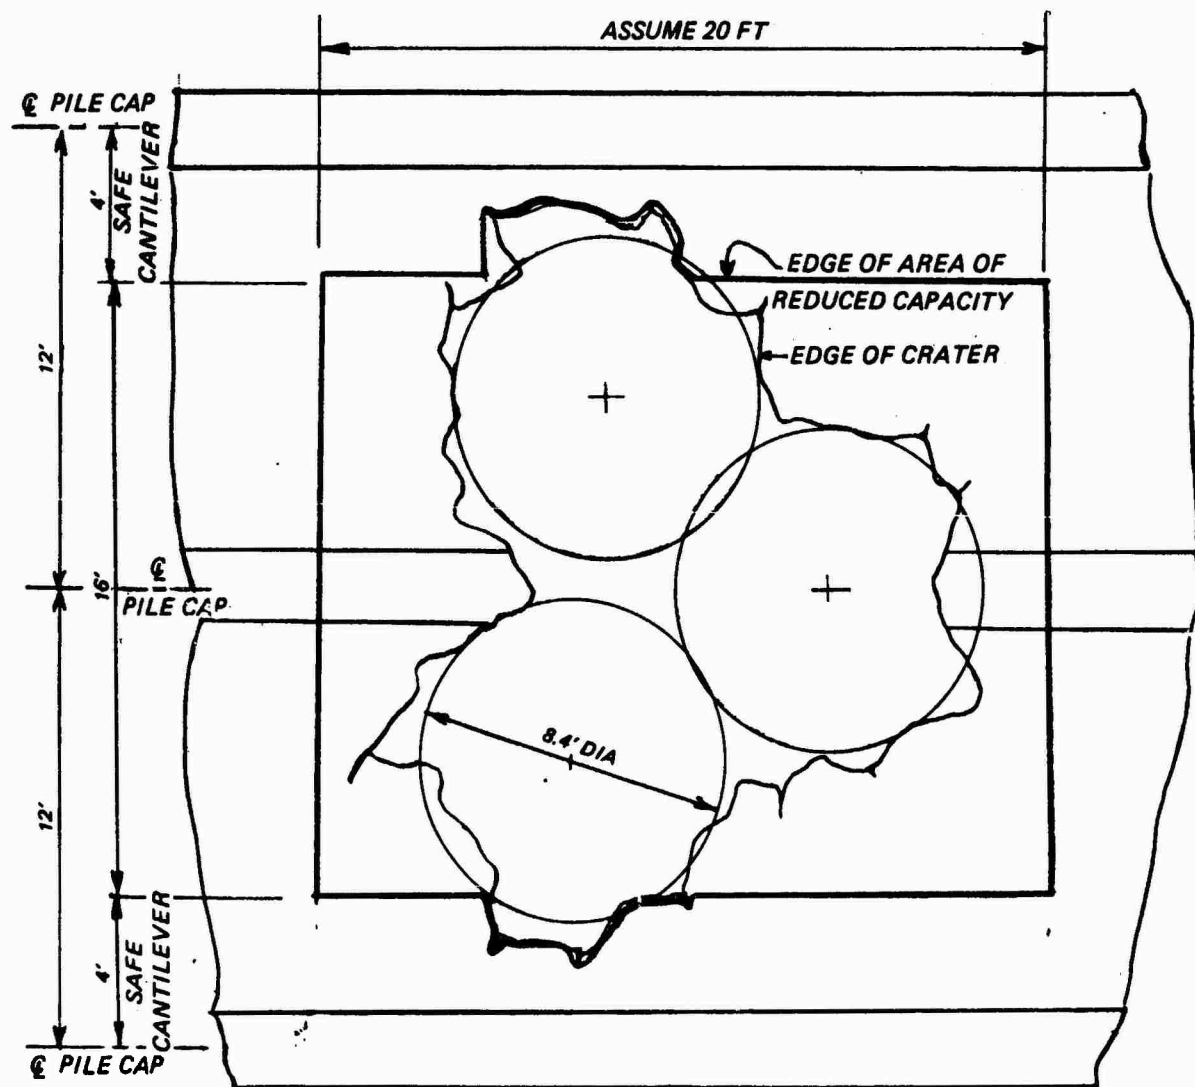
Case 3 damage to Pier 7, NAVSTA (Complete loss of two spans is assumed)
